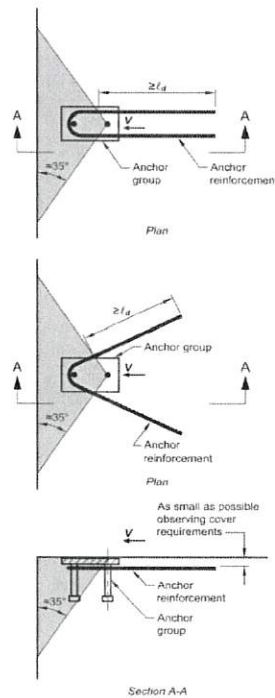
(a)—Hairpin anchor reinforcement for shear
